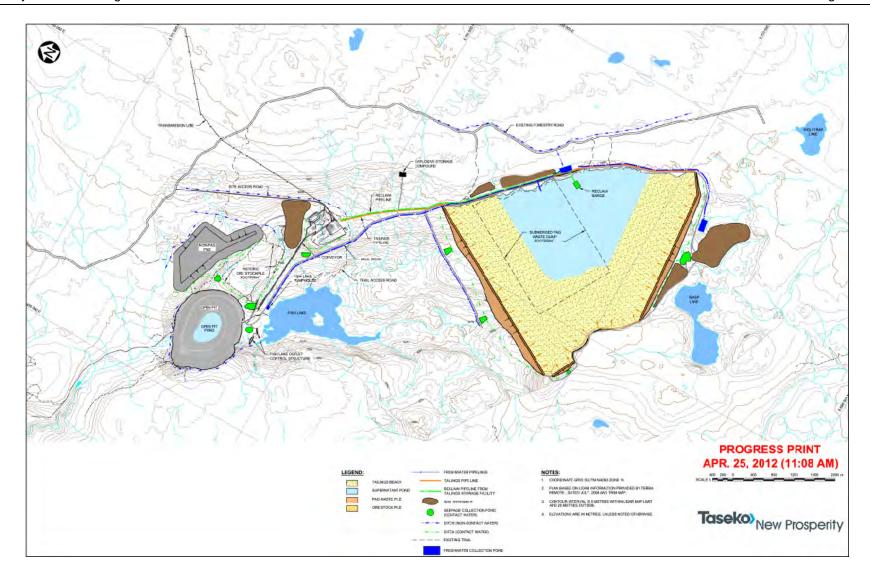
Site Plan at Maximum Disturbance Arrangement
